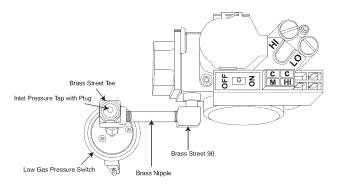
Alternate Low Gas Pressure Switch - 17 1/2-in and wider furnaces
